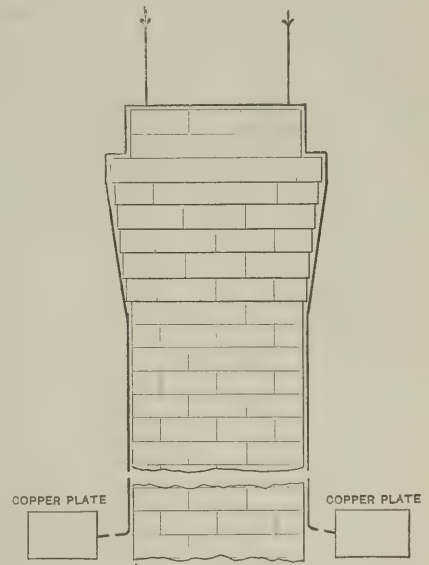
View of Boiler House Chimney Showing Rods and Groundings.
